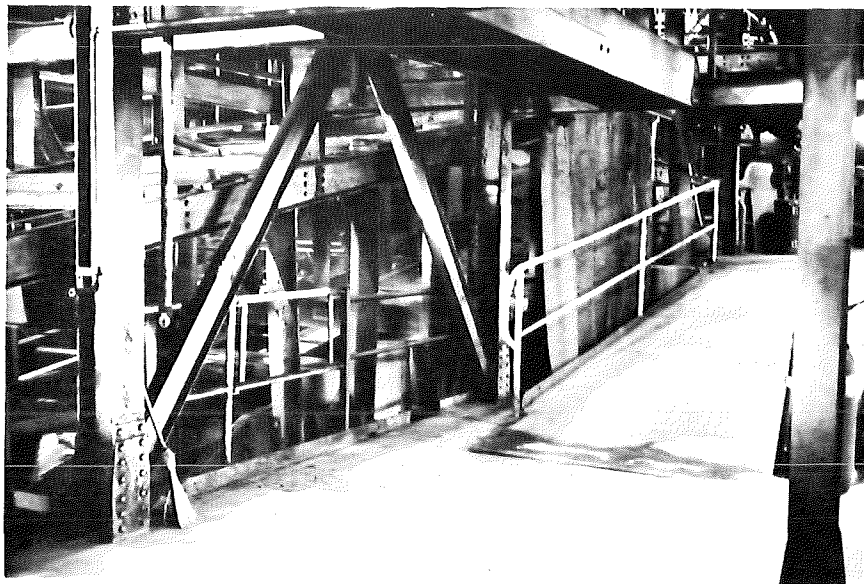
CLEAN-COAL DESANDING SHAKERS BEFORE CURTAIN INSTALLATION (LOOKING TOWARD RAMP TO BUILDING A).
